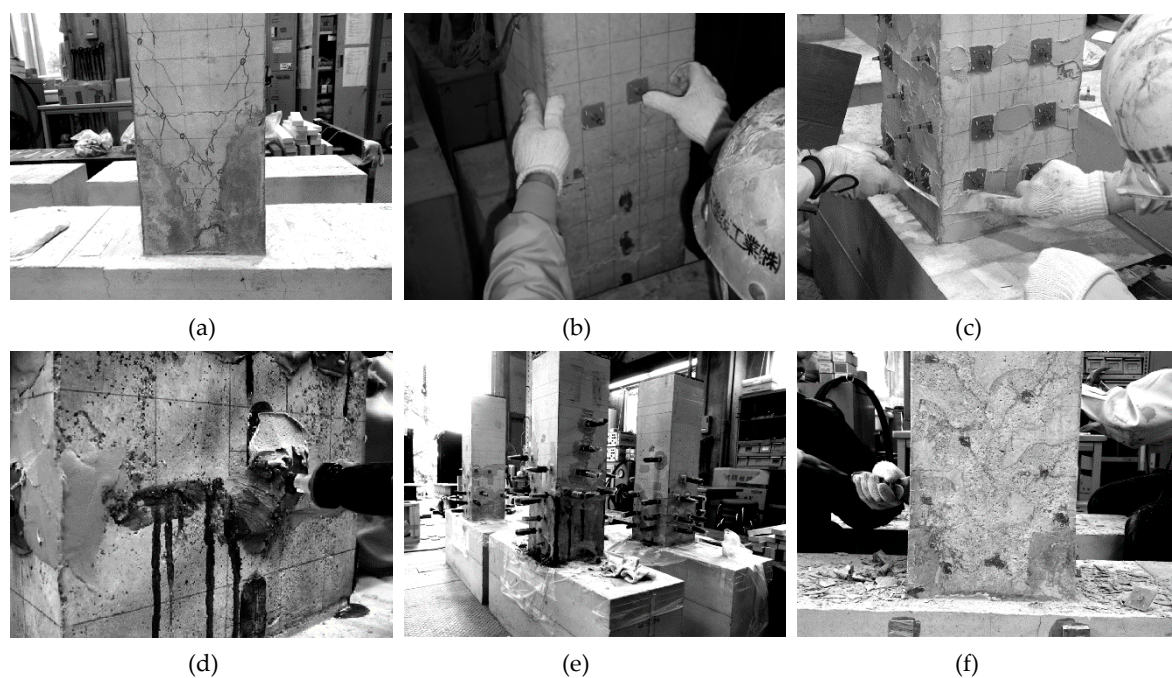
Procedure of injection of epoxy resin into the crack. (a) Remove surface dust; (b) Place tube attachments; (c) Caulk cracked parts; (d) Inject resin by inside pressure of tube; (e) Cure until resin hardens; (f) Finish the surface.
